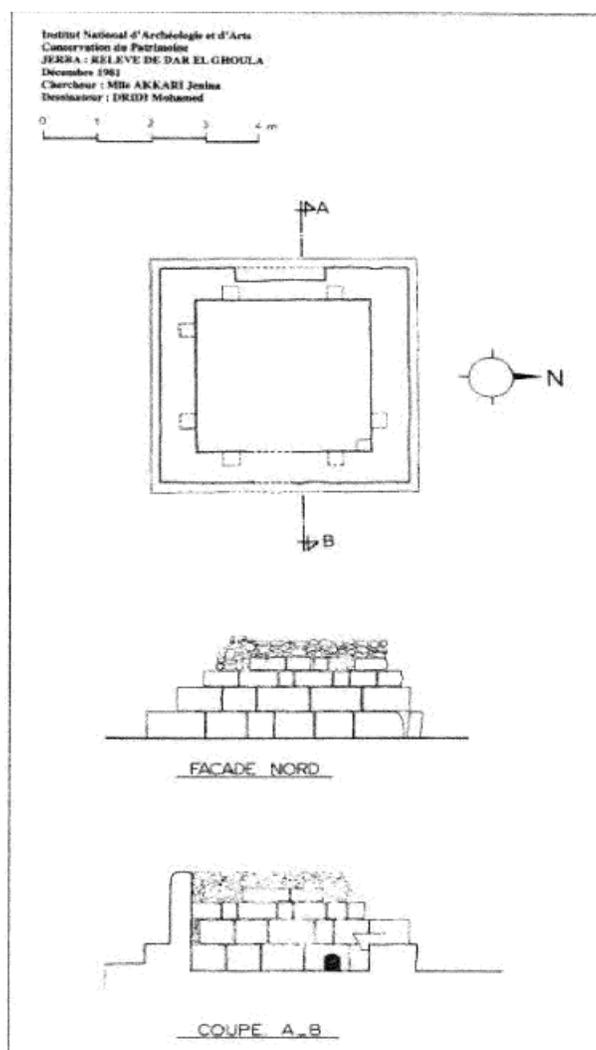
Plan, elevation, and cross-section of Columbarium Dar El Ghoula.
